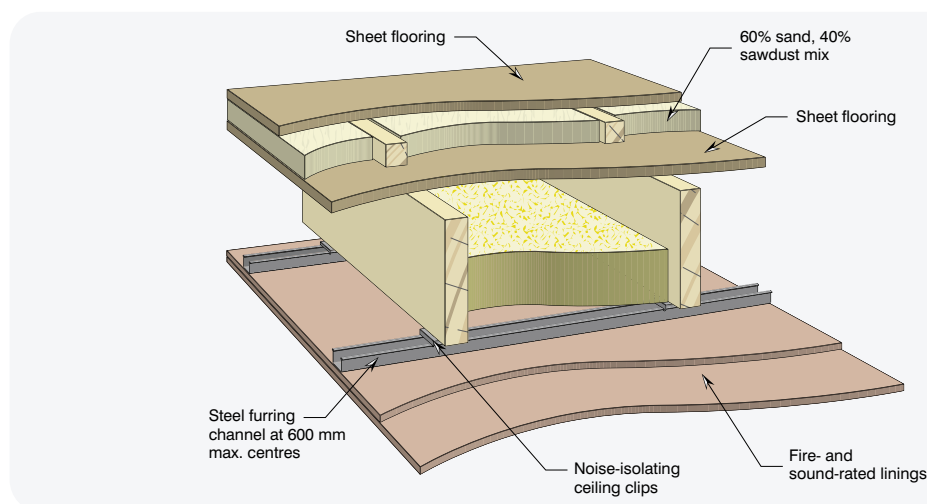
Adding mass to the floor system through the use of a sand/gravel top layer.
